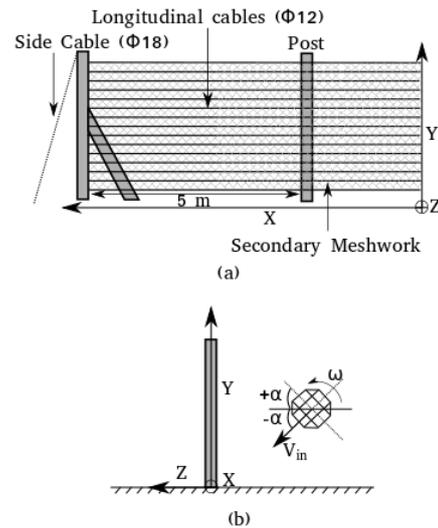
Geometry and impact conditions for the cable-net protection barrier: a) back view and b) side view.
